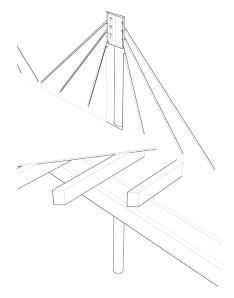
Detail of the cables slotted into the walls, frame and piles (by author).
